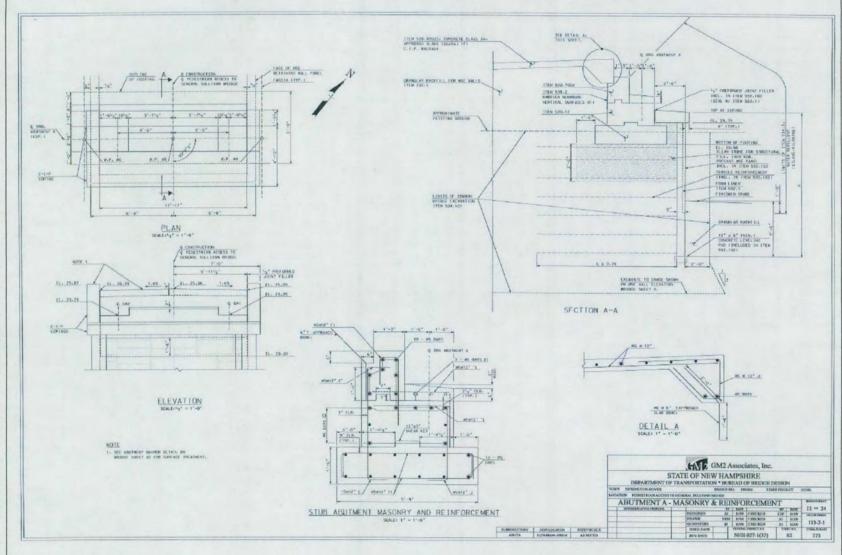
2009 plans for the new north bridge approach and abutment modification, Abutment A – Reinforcement. Masonry 00
